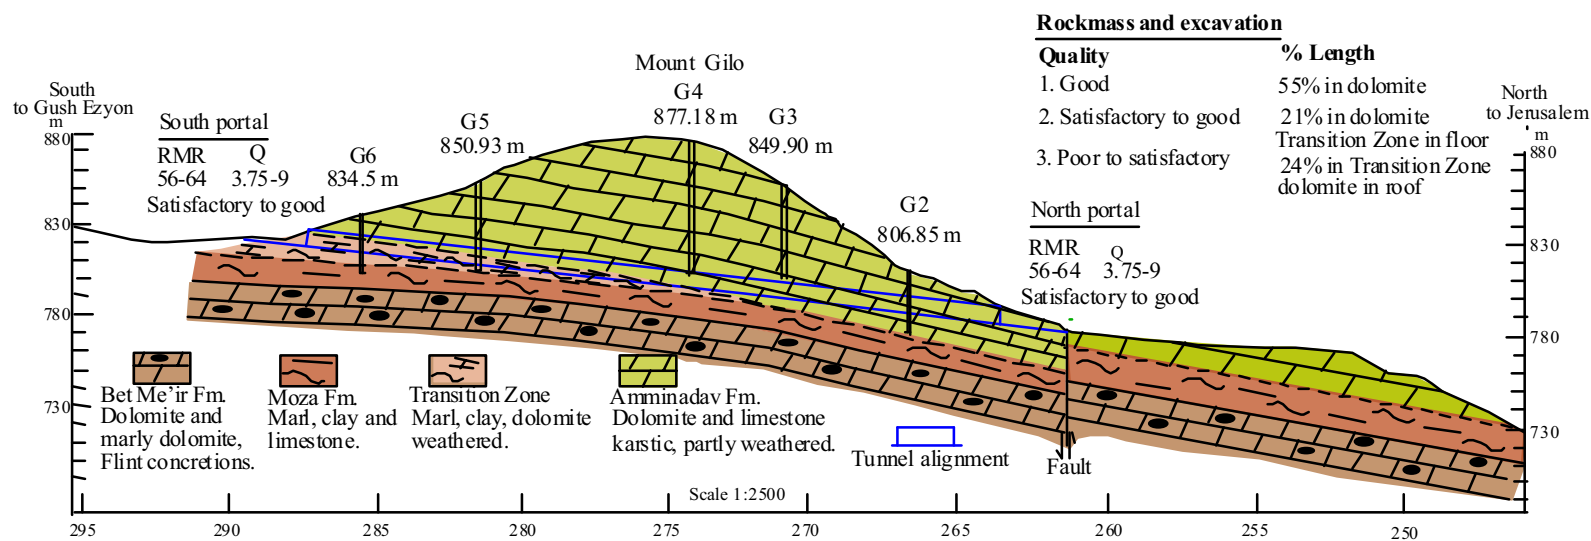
Geotechnical cross section along the Gilo Long Tunnel.
